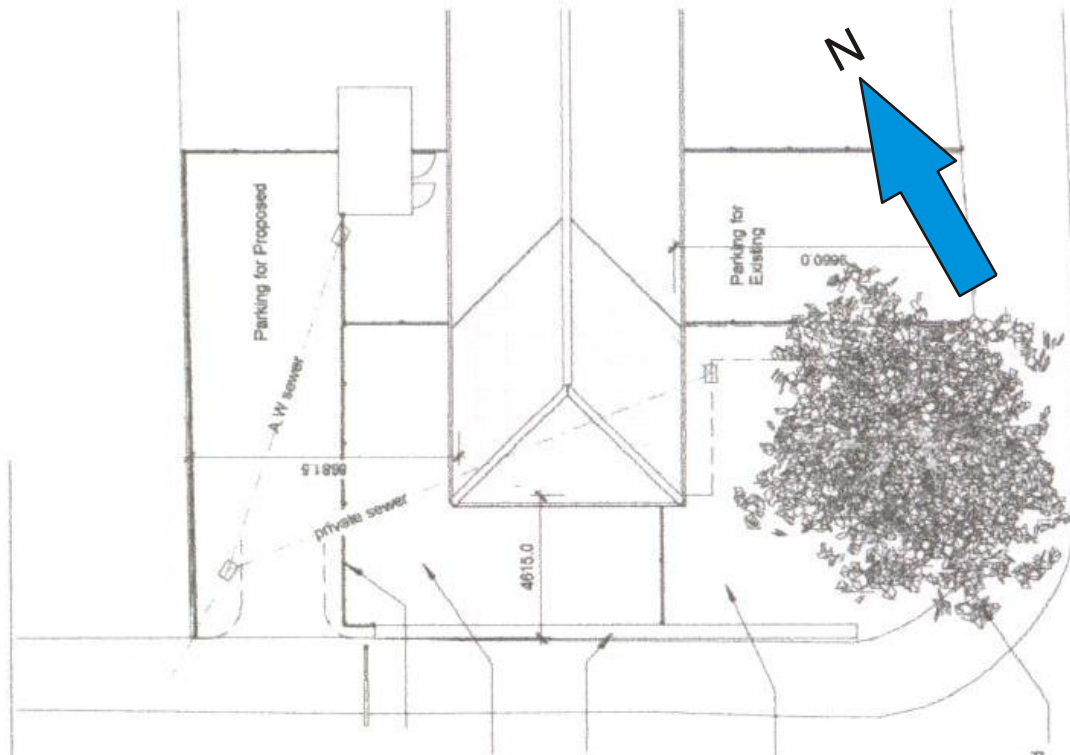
Block Plan Showing the Proposed Layout of the Development Site at an original scale of scale 1:200, (not to scale), (extract from Architects plan).
